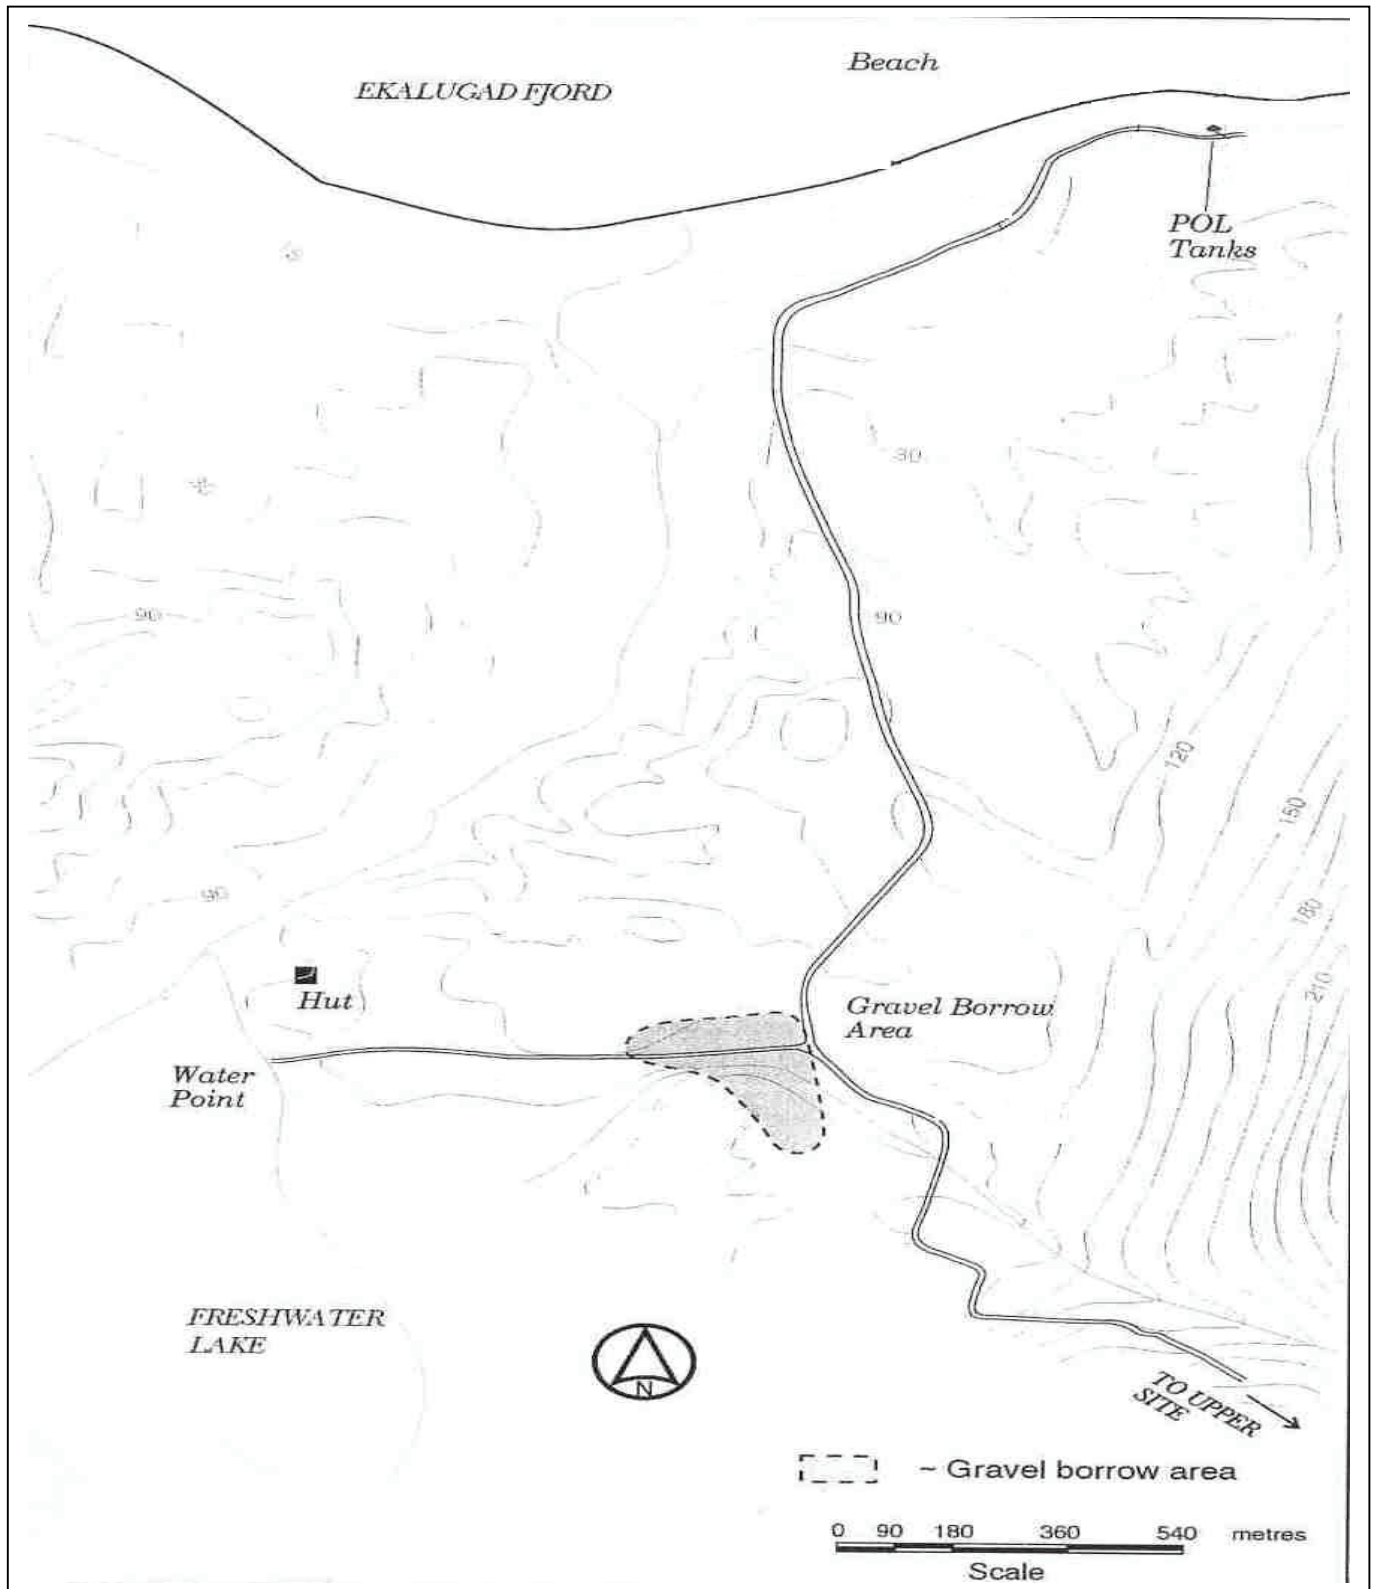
Lower Site Layout of FOX-C DEW Line Site
